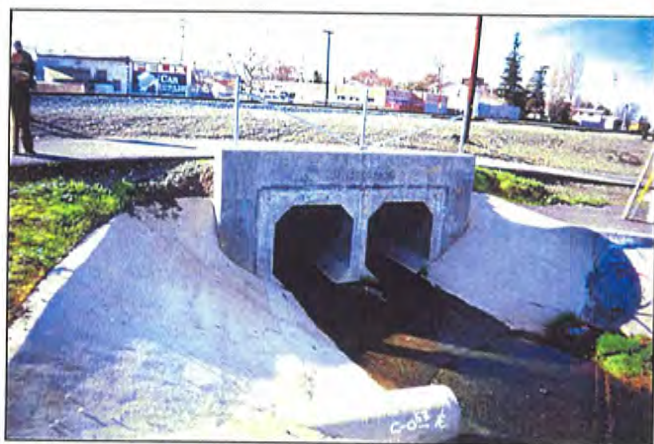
Headwaters of 16<sup>th</sup> Avenue Drain at Southern Pacific Railroad
